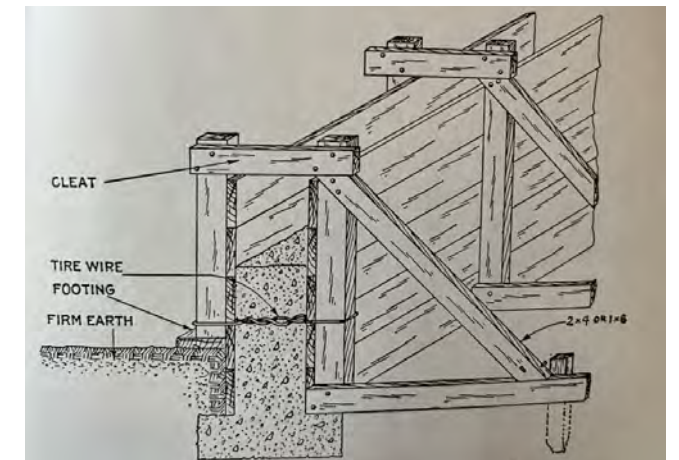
Single side foundation form, for foundation built in firm earth. (Source: Concrete Construction, International Textbook Company lcs)
